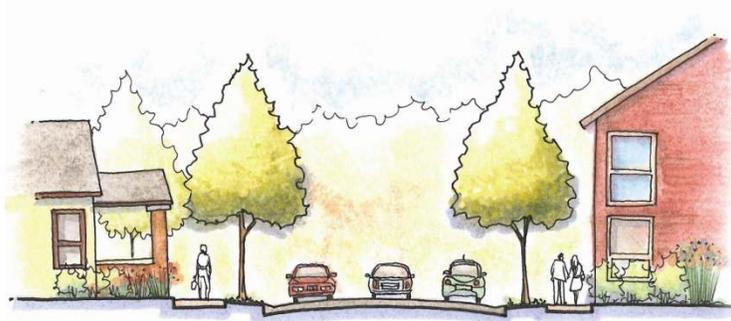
H: Typical cross-section of an urban development subcollector street with parking on one side of the street
